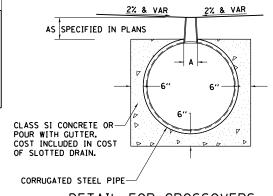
DETAIL FOR CROSSOVERS. DRIVEWAYS. OR PARKING LOTS
